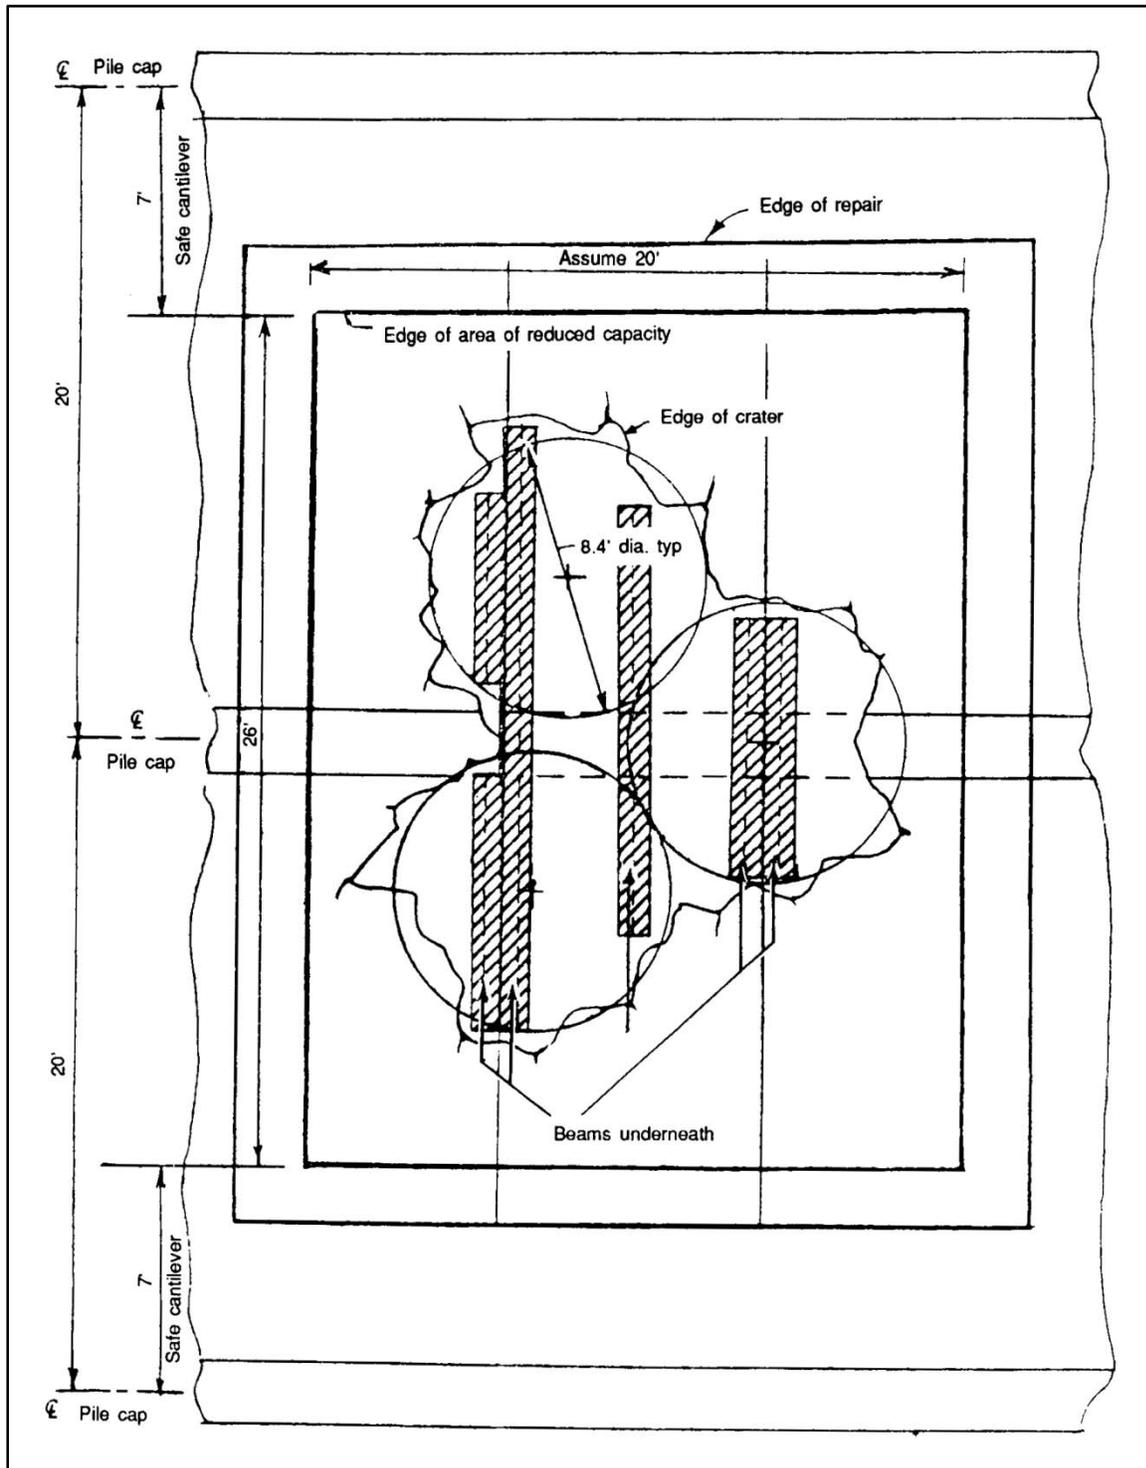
Steel plate reinforced with steel beams (repair for case 3 damage - 60 foot of steel beam required, three 1-inch thick, 8- by 30-foot plates required - reinforced plate subconcept)
